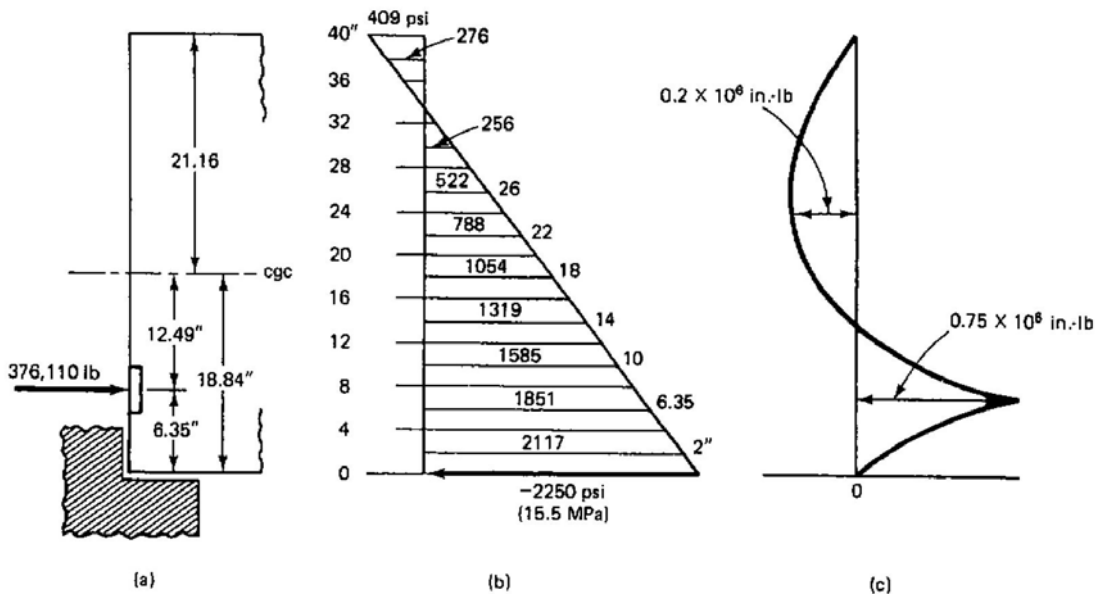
Anchorage zone stresses and moments in Example 4.6. (a) Post-tensioned end-block zone. (b) Transfer concrete stress distribution across depth. (c) Net anchorage zone moments on potential horizontal cracking planes along the beam depth.
